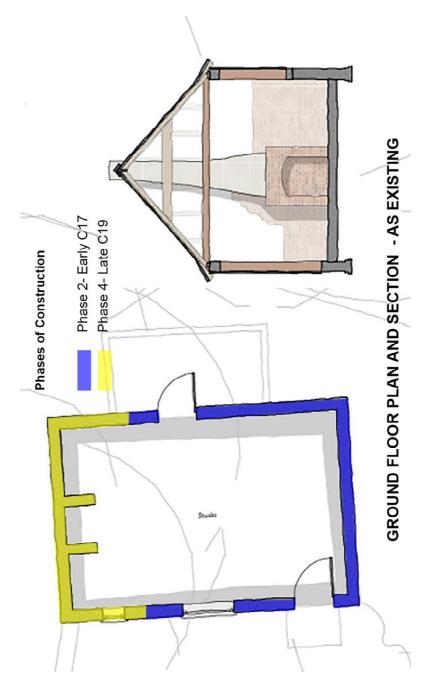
Ground Floor Phase Plan - Outbuilding (Base Survey drawings by Shiel Architecture Ltd.)
